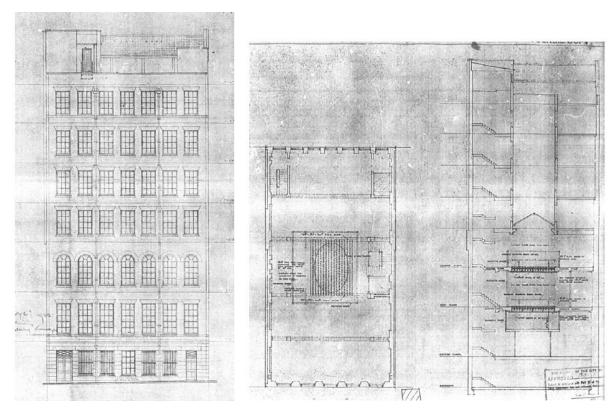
LHS: Beneficial House—Wynyard Lane elevation as documented in 1922. (Source City of Sydney Archives, BA 74/22, as presented in the Beneficial House CMP, 2004)
